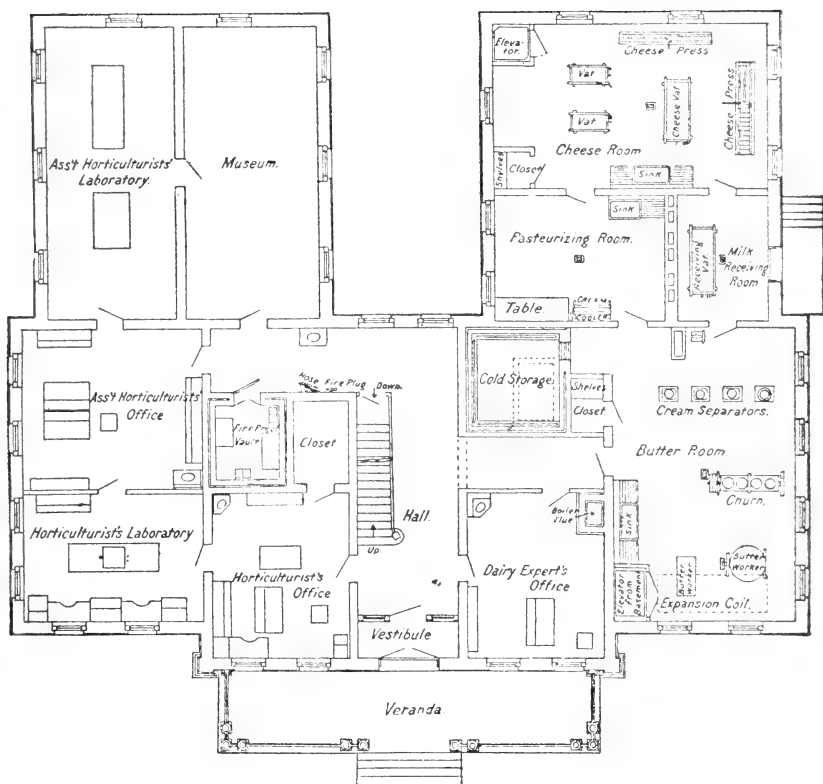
FIRST FLOOR PLAN OF BIOLOGICAL AND DAIRY BUILDING.
